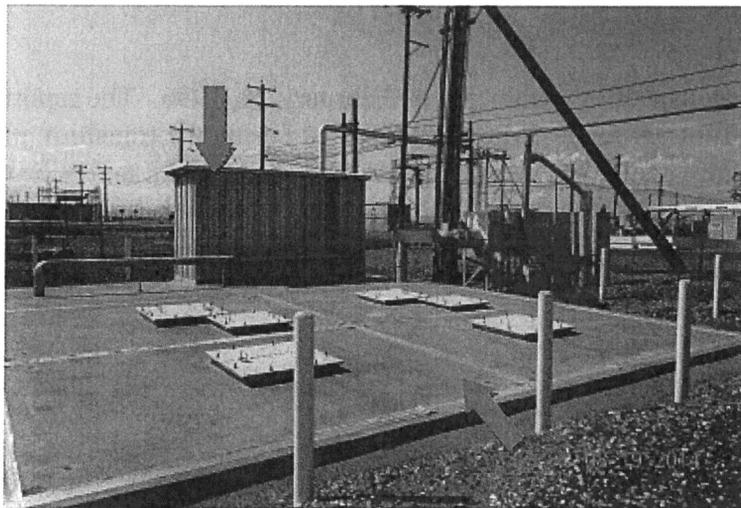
Building 221-BF (~Southwest corner of B Plant Complex)
